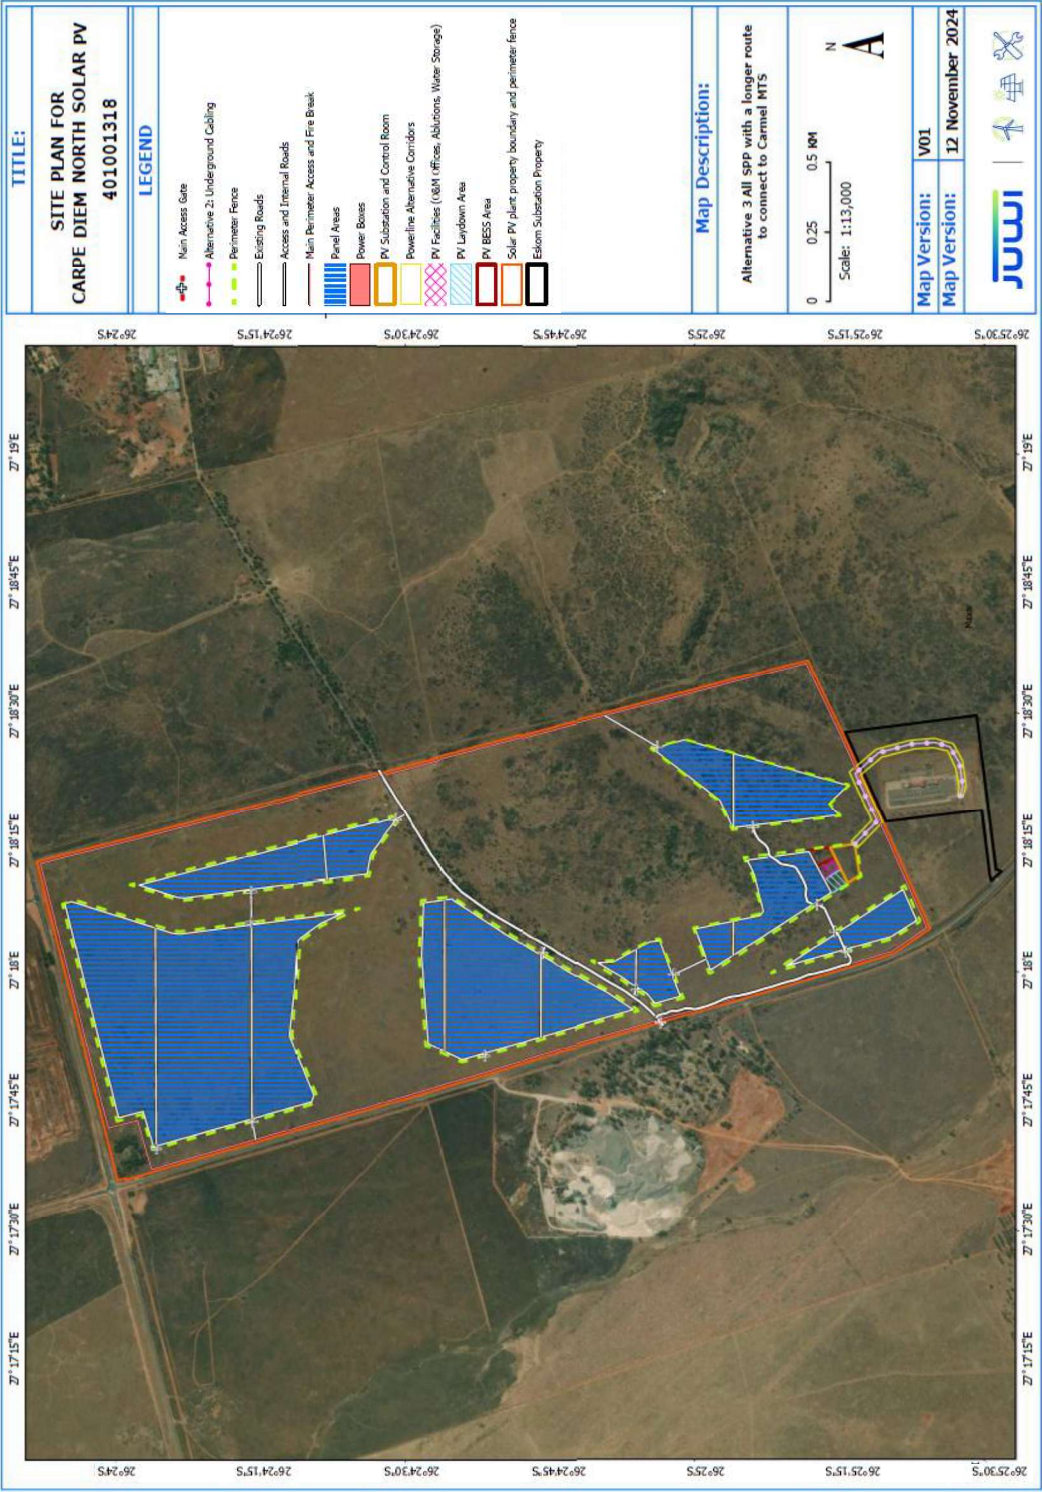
Detailed site layout map of the proposed Carpe Diem North SPP – Alternative 3 layout, the least preferred alternative.
